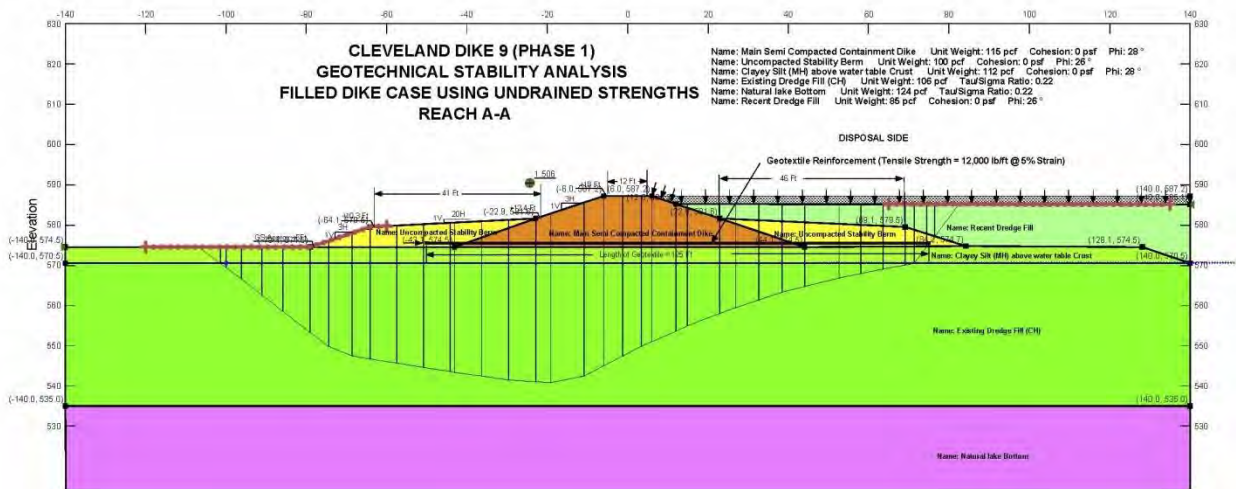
CDF 9 Geotextile Reinforcement Stability Section
